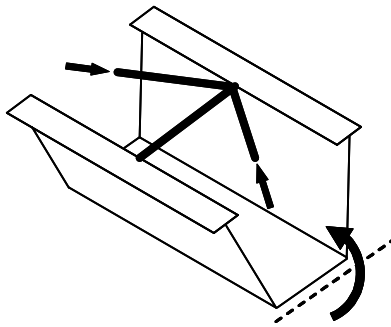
BRACE FORCES DUE TO VERTICAL BENDING OF GIRDER
